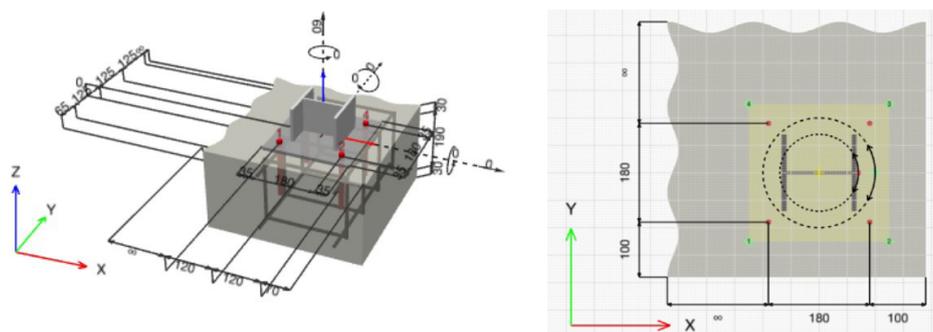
Additional supplementary reinforcement in concrete base material
